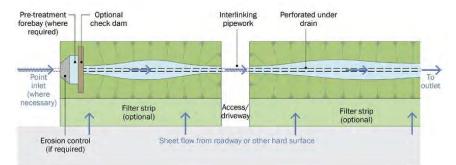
Typical plan of a swale (CIRIA C753 figure 17.5)
